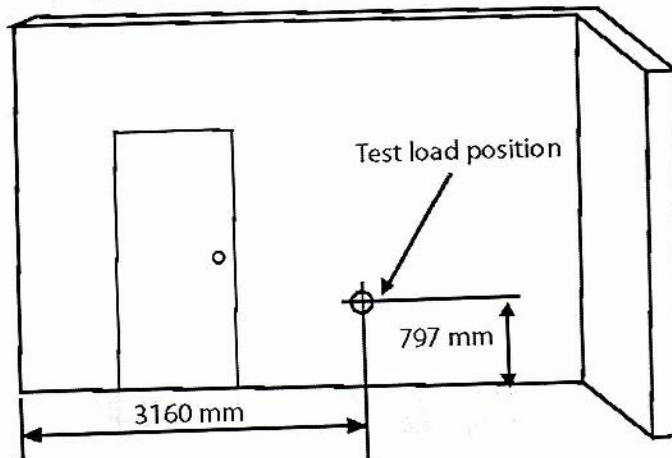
Locations of applied load for lightweight anchorage Pull-out test
